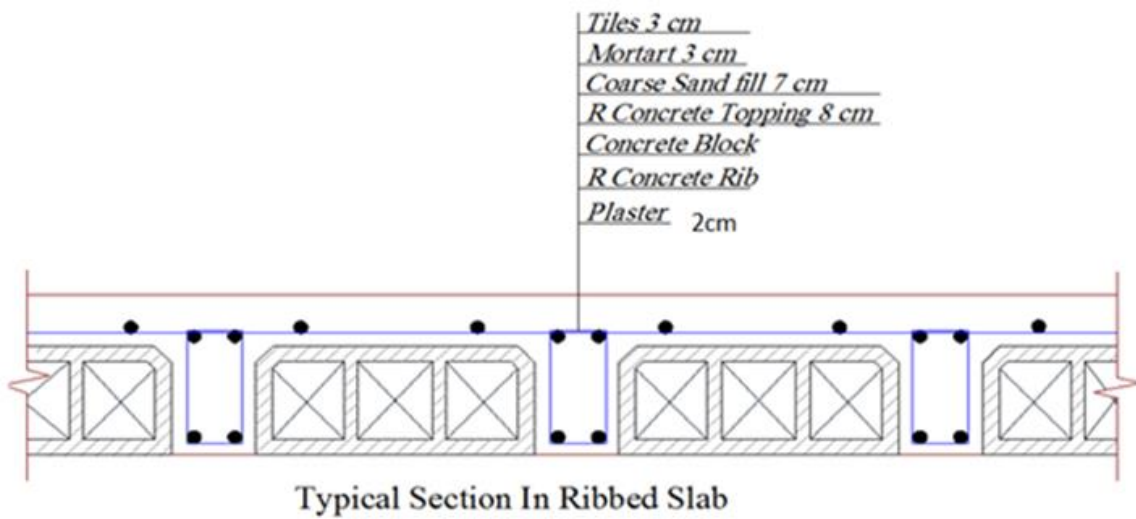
One Way Rib Slab (RB1-2) in basement #1
